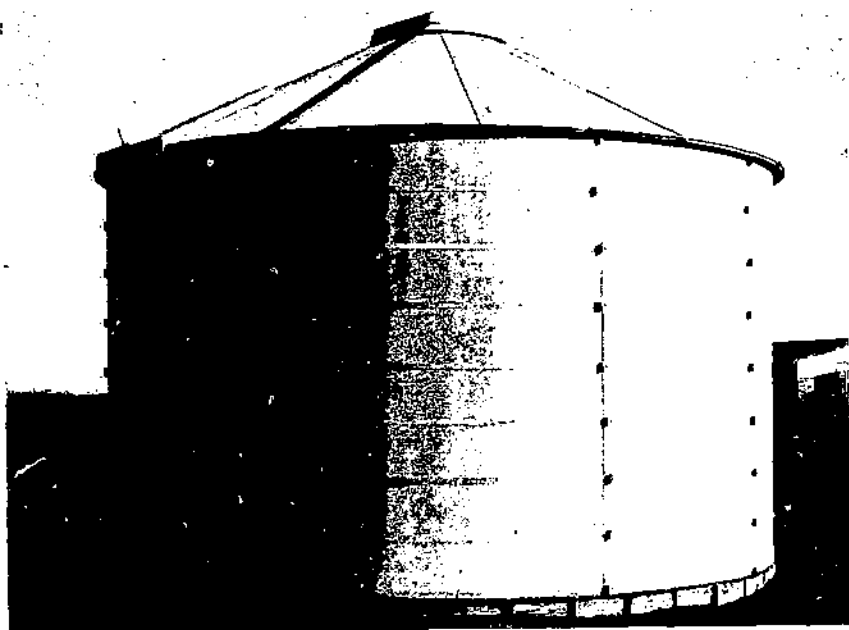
Circular bin, using wallboard panels for walls and roof at Jamestown. This bin contained no spaces between the 2 sheets of wallboard.
